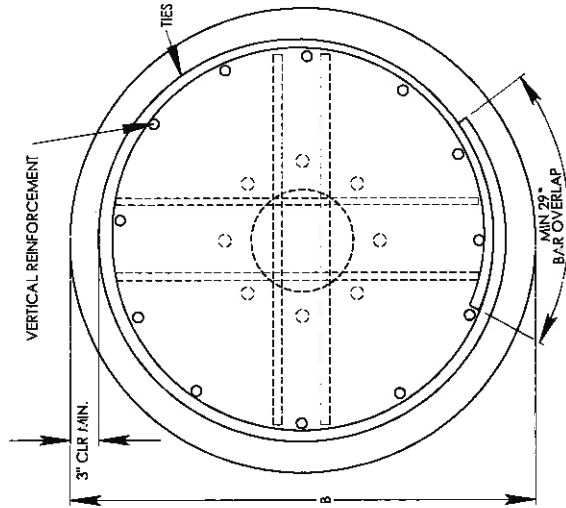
Technical drawing for Pier Foundation 33 ft. Tower
